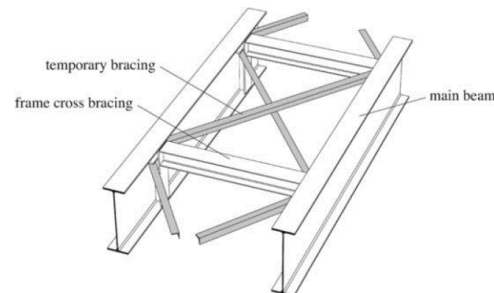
Plan bracing (Lebet, Hirt, 2013)
